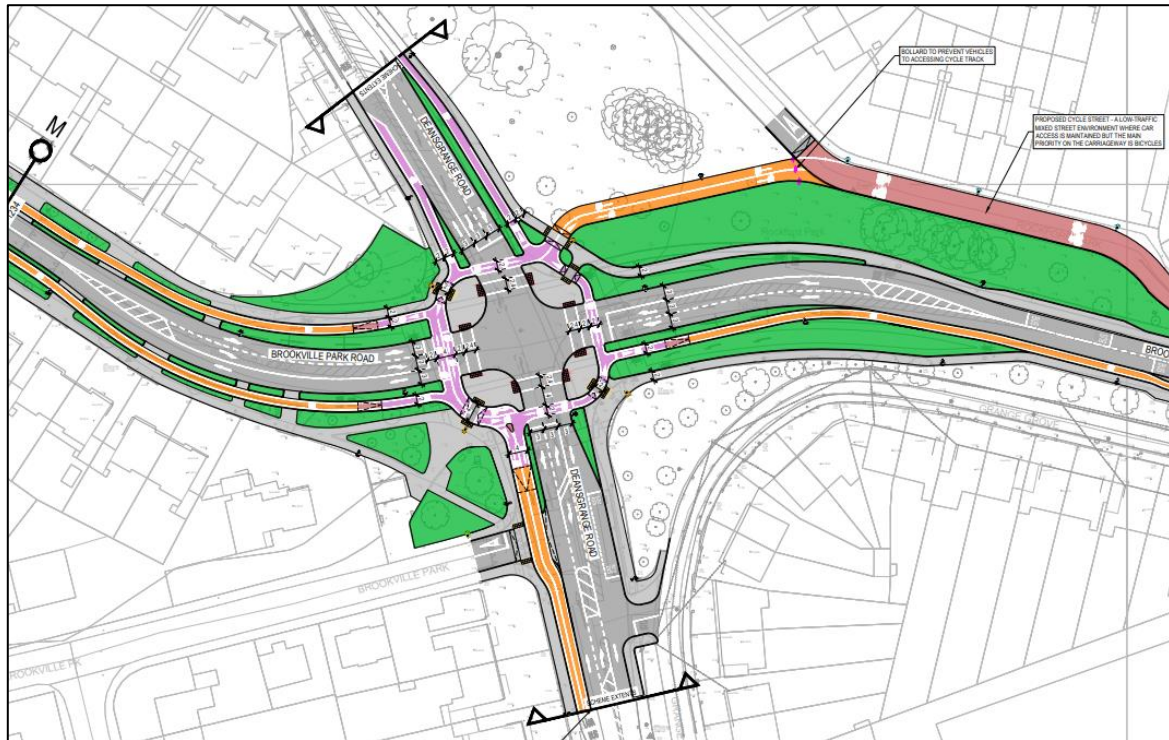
Brookville Park / Deansgrange Road / Monkstown Link Road DS 2028 Layout
